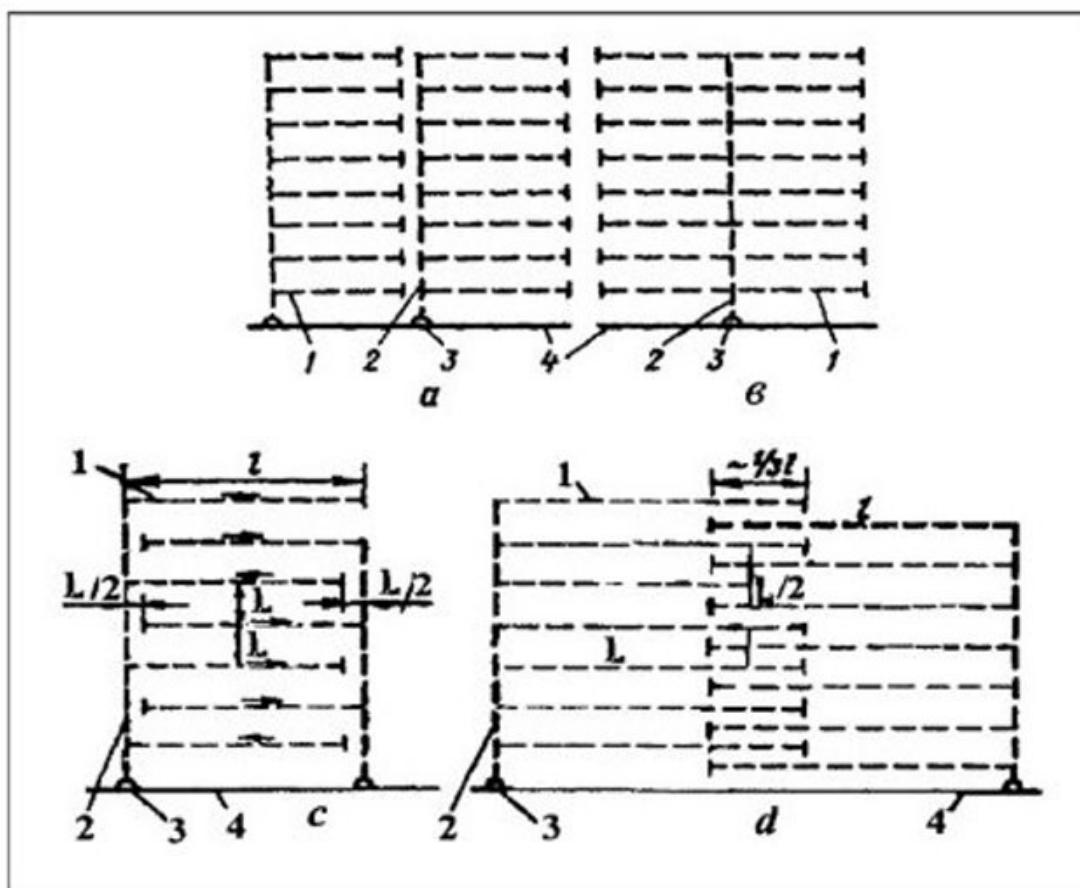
Drain arrangement patterns: (a) unilateral and (b) bilateral connection of drains to collectors; (c) alternate connection of drains to neighboring collectors; (d)
